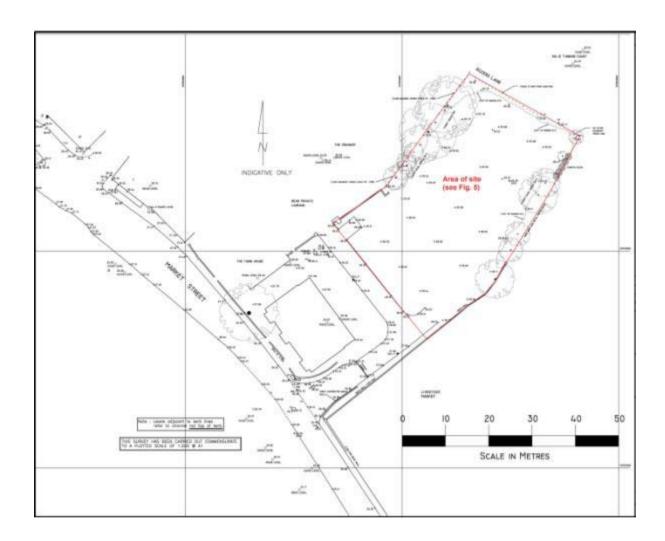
Land at Burtenshaw Lane, Market Street, Hailsham: Site Plan (adapted from plan provided by Park Lane Group)
